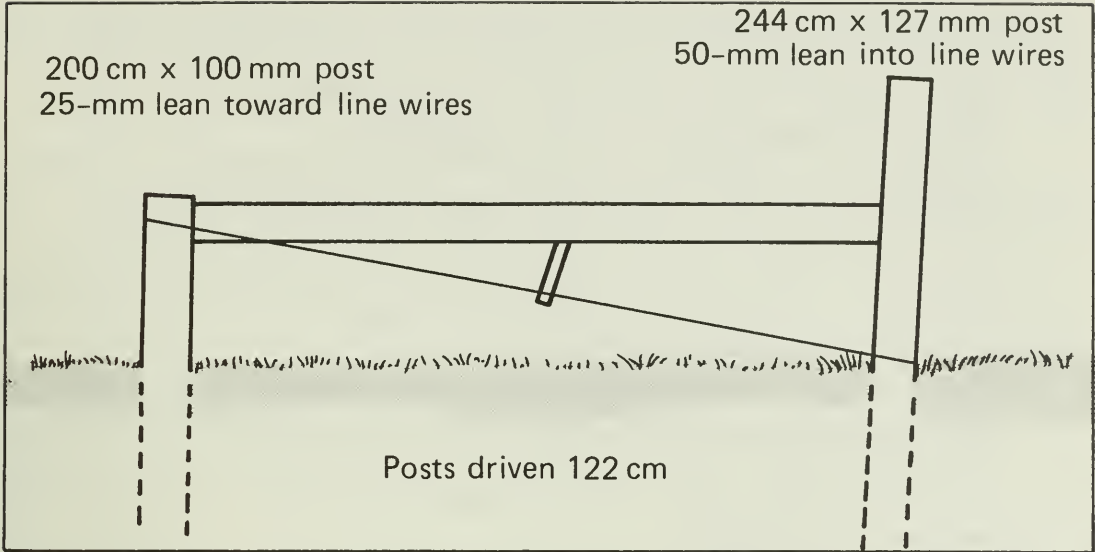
Medium corner brace assembly (Fig. 30) showing construction.
